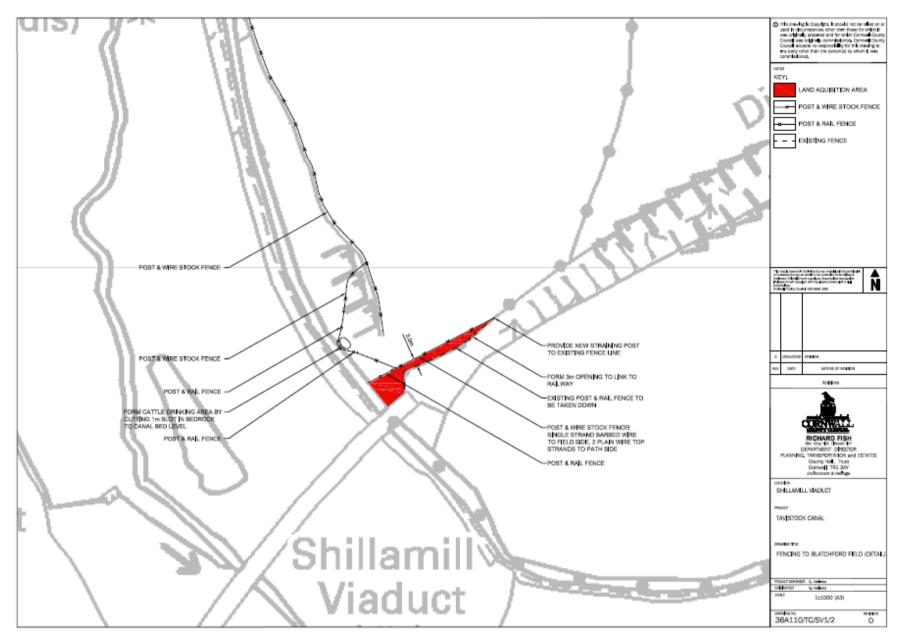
Detail plan showing the cattle drinking area west of the Shillamill Viaduct
